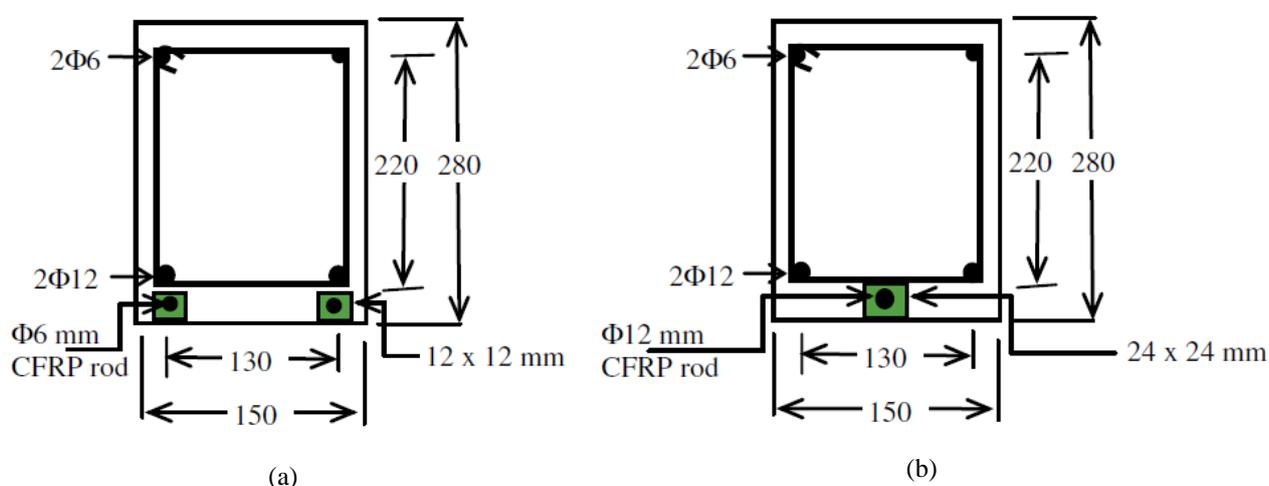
Beam cross section after strengthening with a) two 6mm CFRP rods b) one 12 mm CFRP rod [14]
